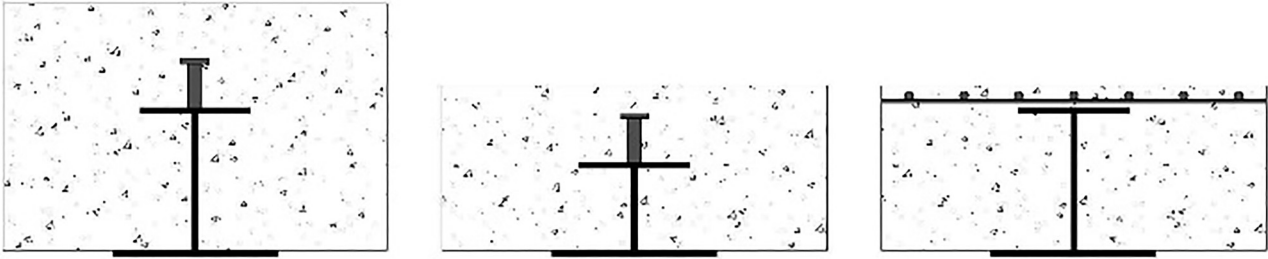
Slim floor beam with shear studs—design problems with the size of the section
